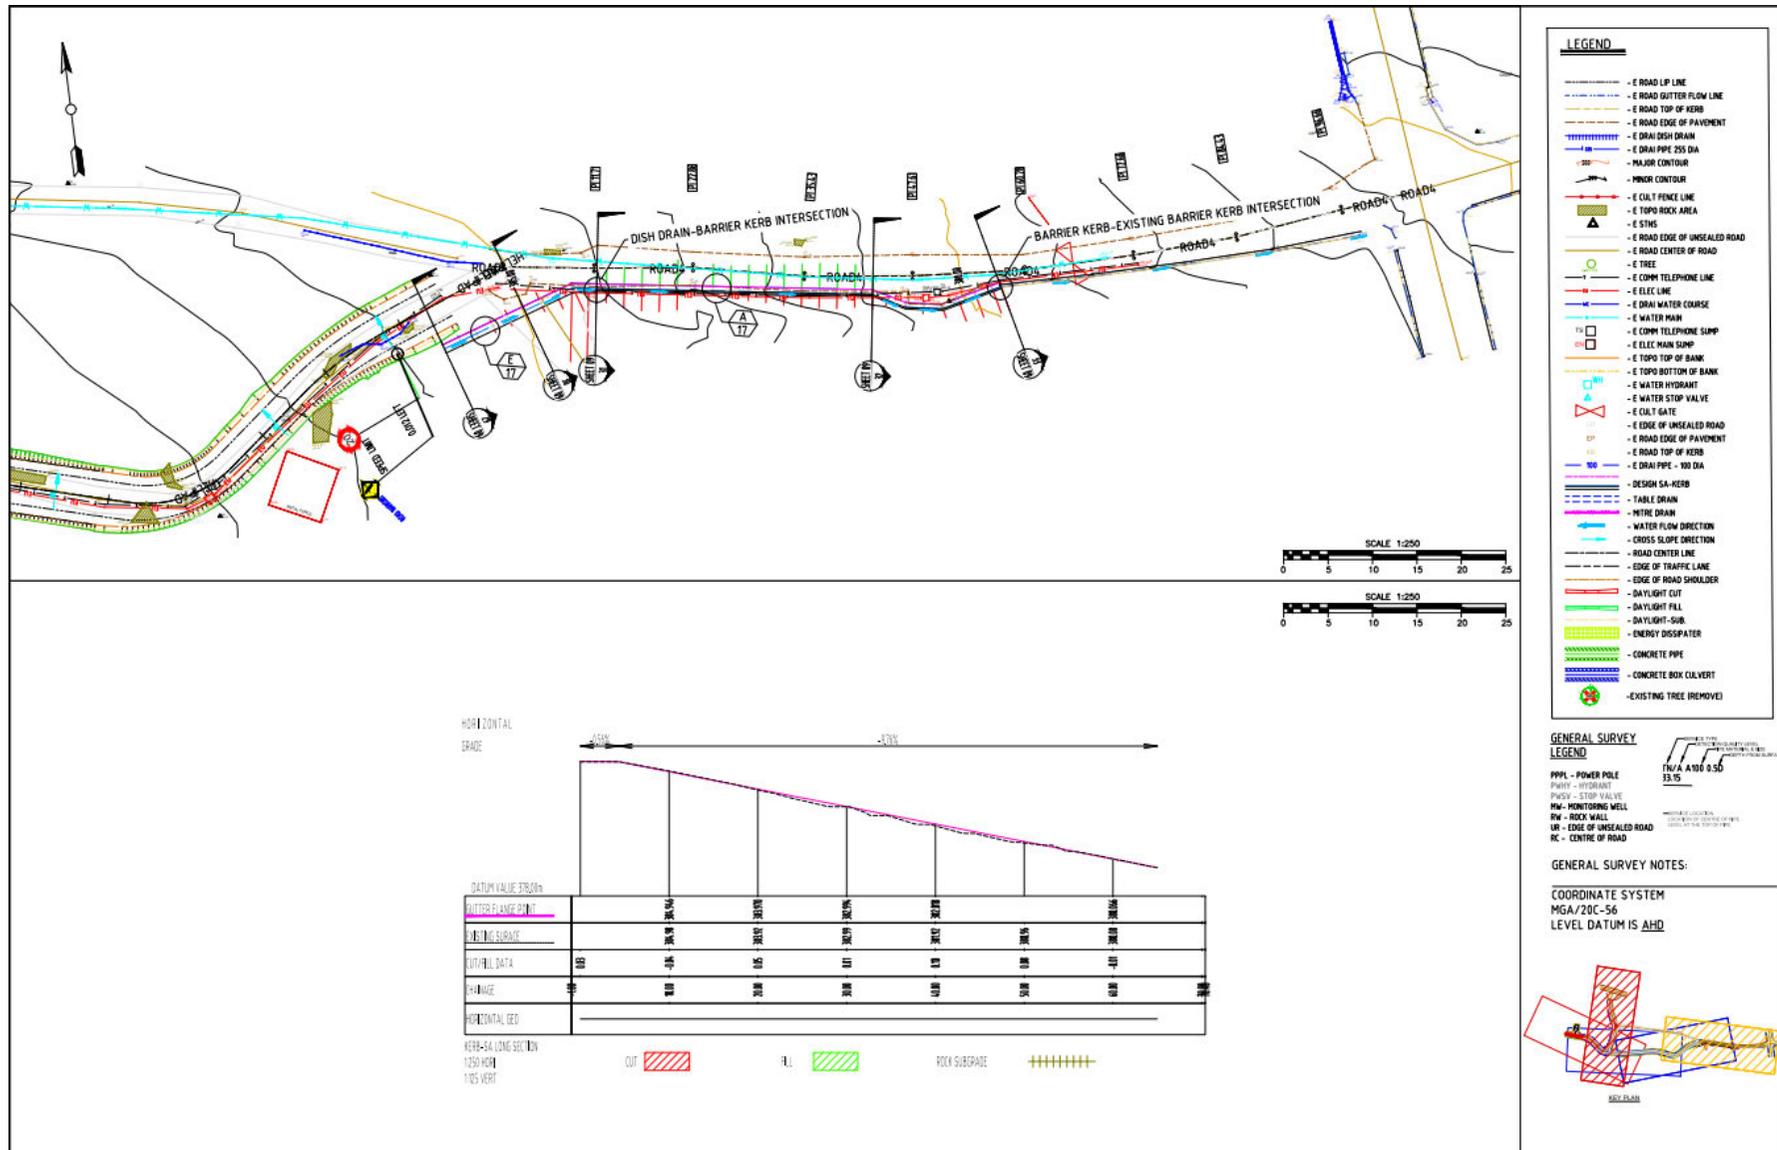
Site plan showing the proposed locations of cuts, fills, and tree removal in Map ID Section 4 (Source: WaterNSW, April 2025)
